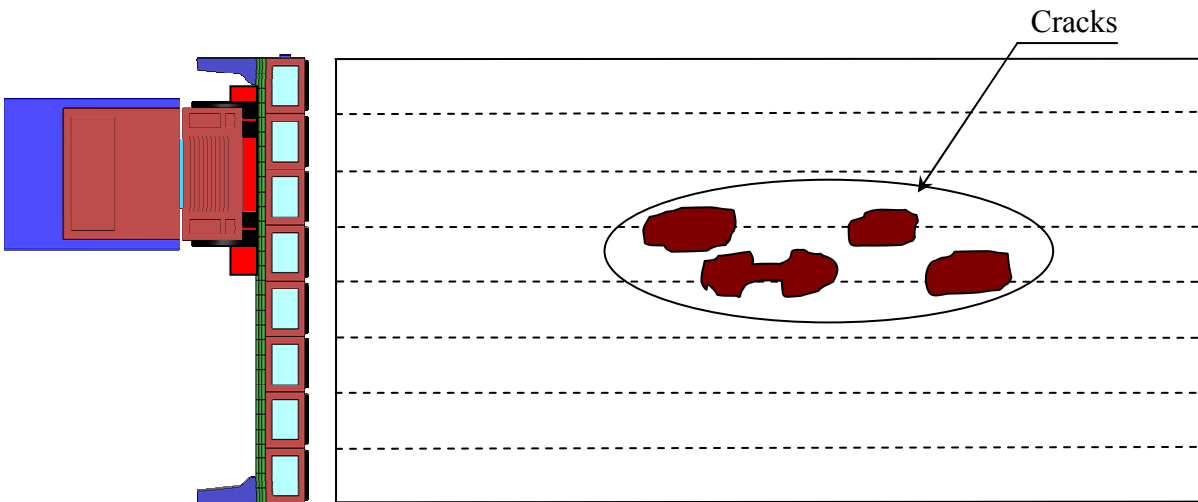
Crack development in the slab bottom surface after applying 120% of AASHTO HL-93 load.
